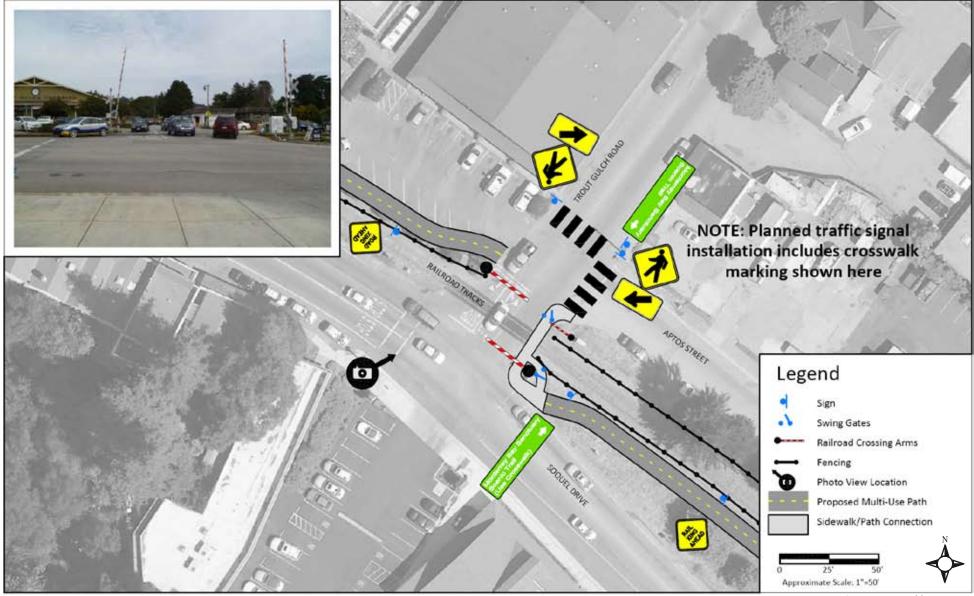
Crossing No. 69, Trout Gulch Road Figure prepared by W-Trans
